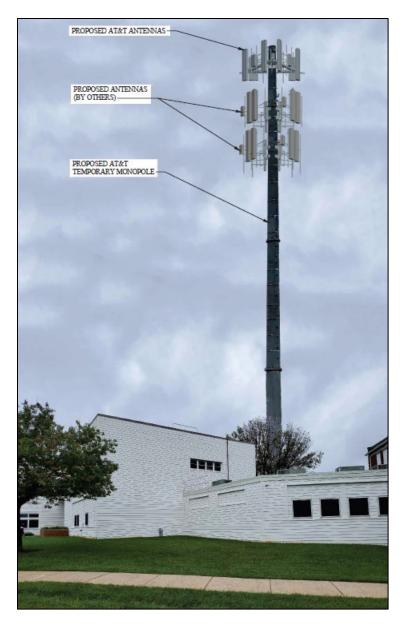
Western Elevation of Proposed Temporary Pole (From Brookville Road)
